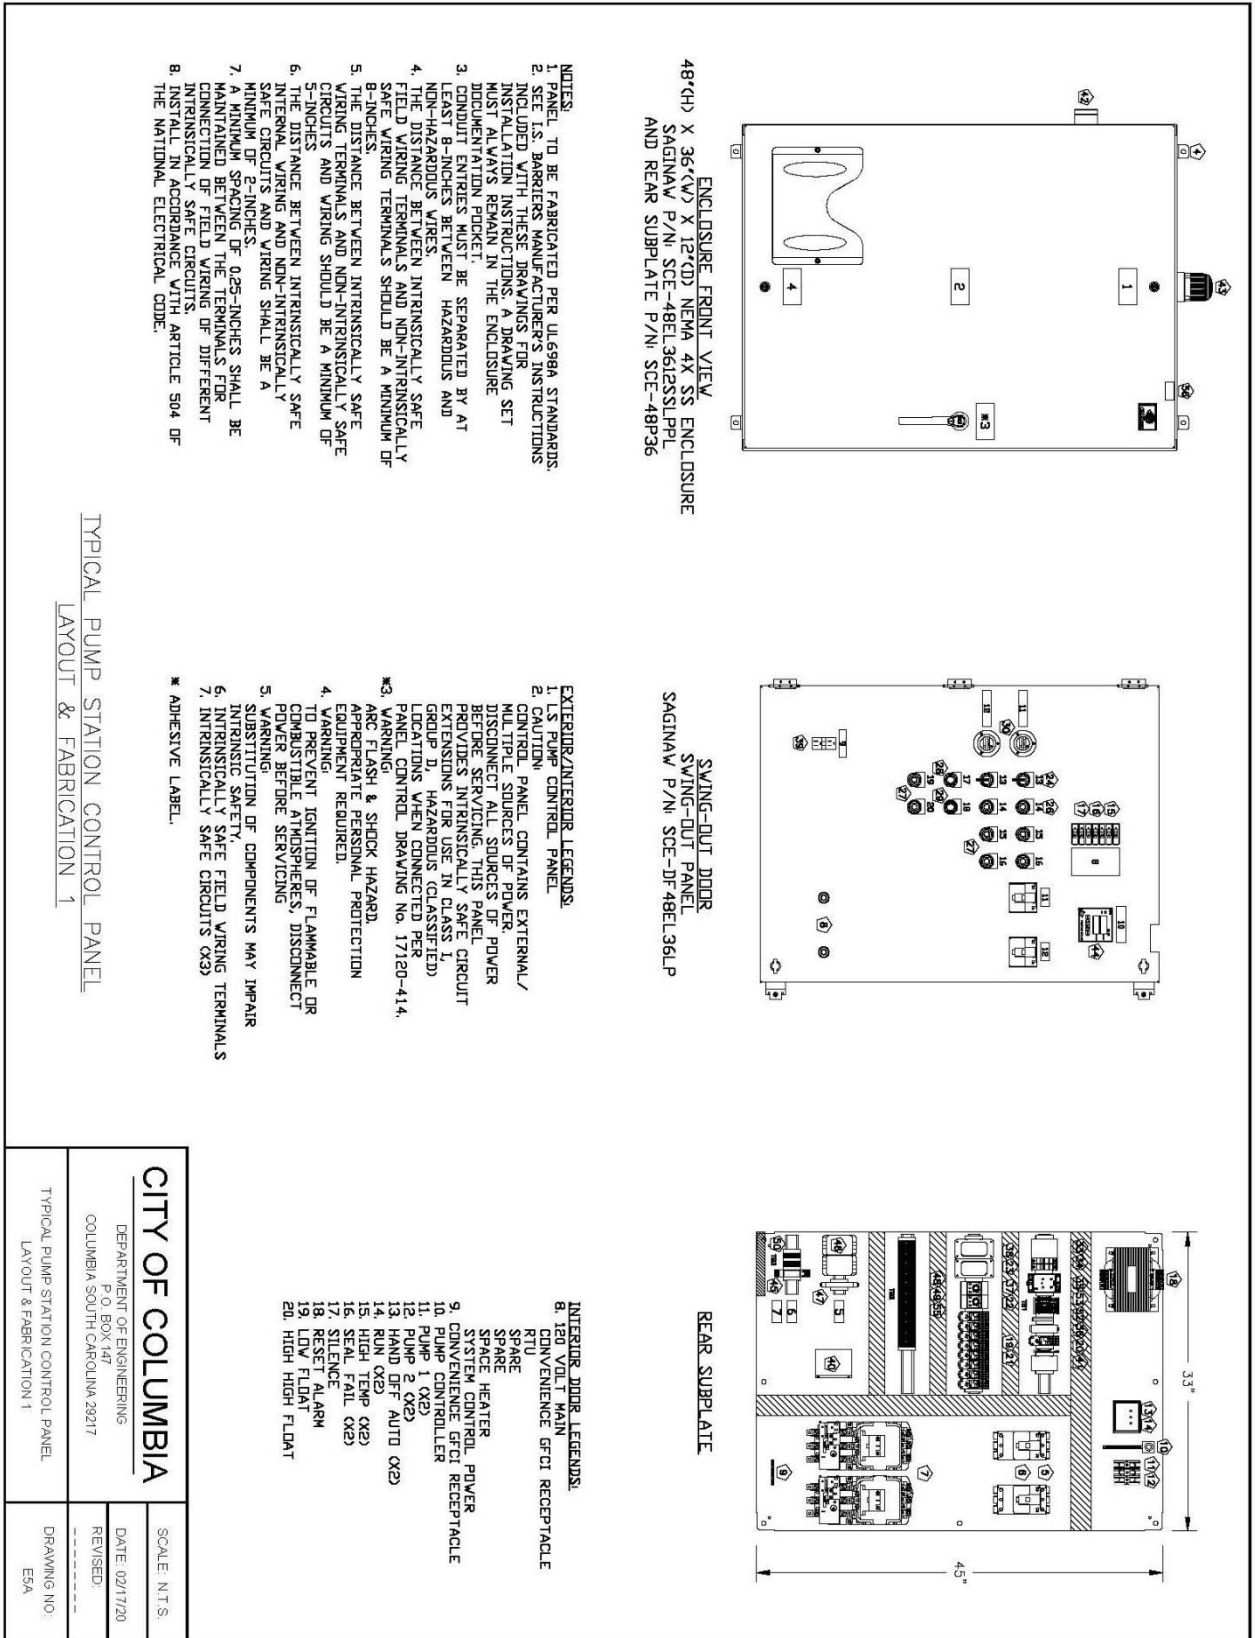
E5A - Typical Control Panel Layout & Fabrication 1
